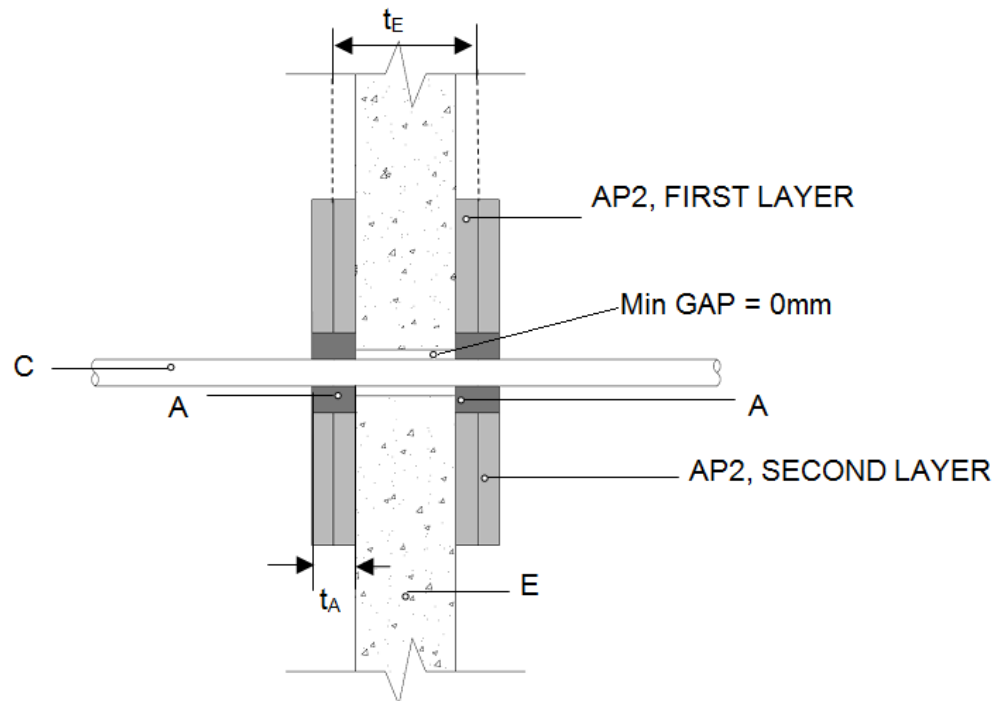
(a) - Details for PE-X Pipes in 75mm rigid wall with additional protection 2 x AP2.
